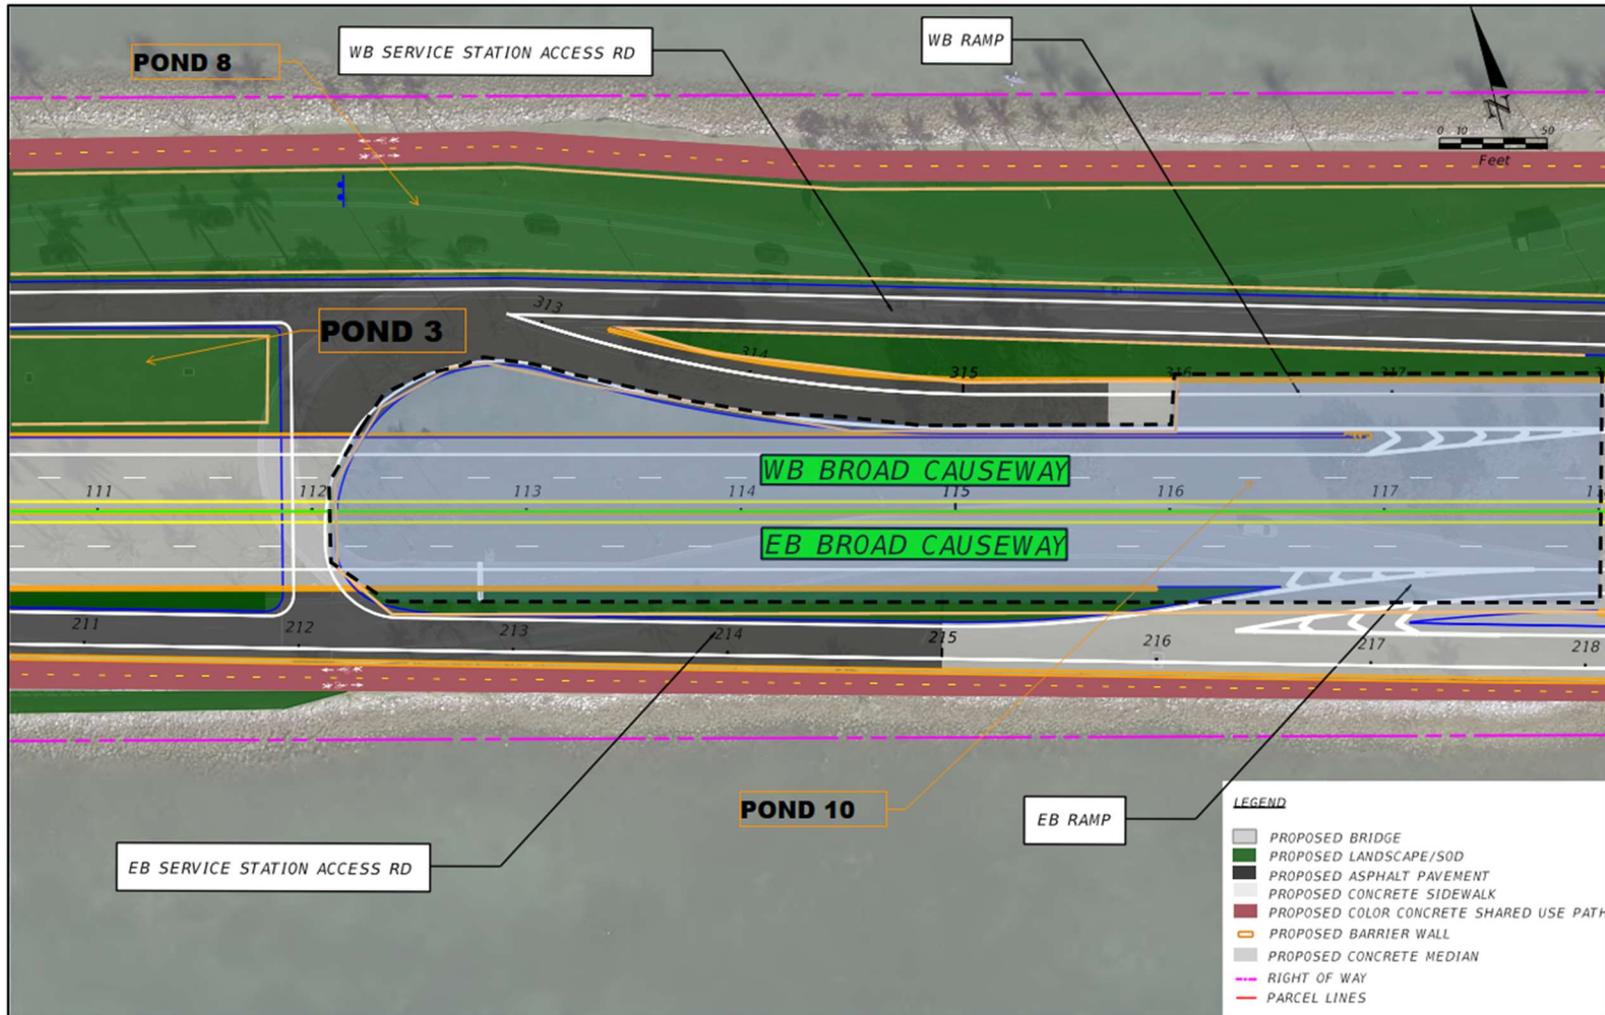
Layout of Retention Ponds on the Causeway Island (2 of 3)
